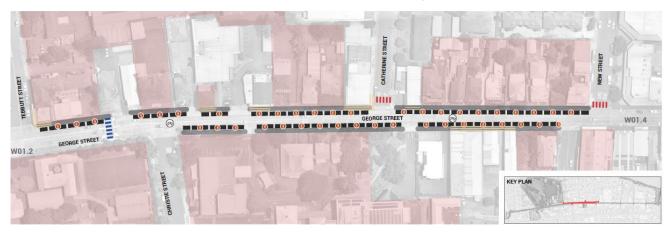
Proposed upgrades for W01.3 George Street Green Boulevard
